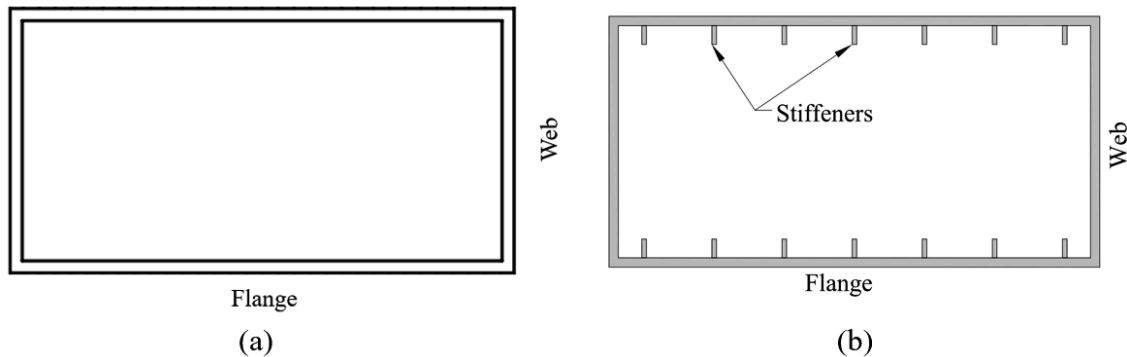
(a) Steel box beam without stiffeners, (b) Box beam with stiffeners at flanges
